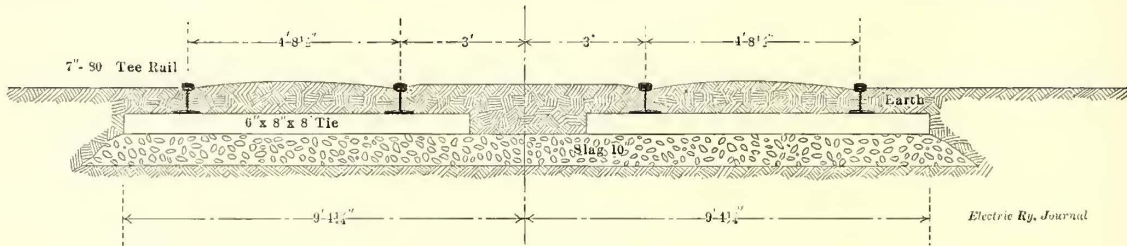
Slab Ballast Construction for Unpaved Streets in Birmingham, Alabama
